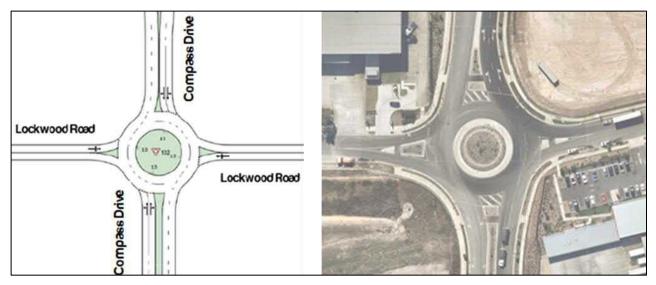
Intersection Layout of Compass Drive & Lockwood Road
